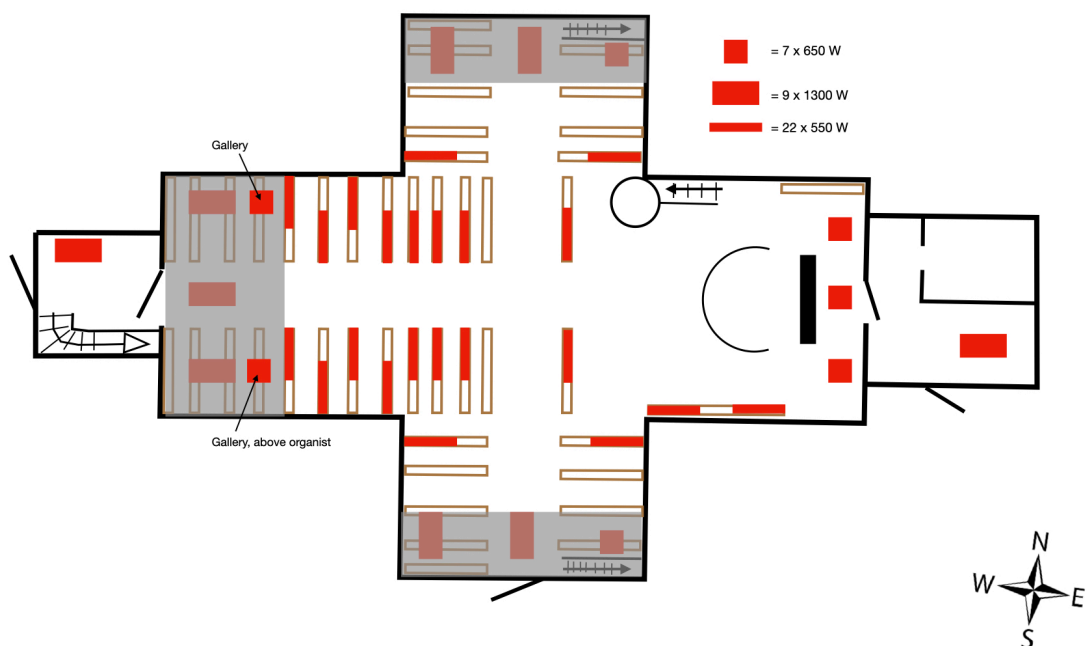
Eide Church Floorplan and Heating Panel Placement
